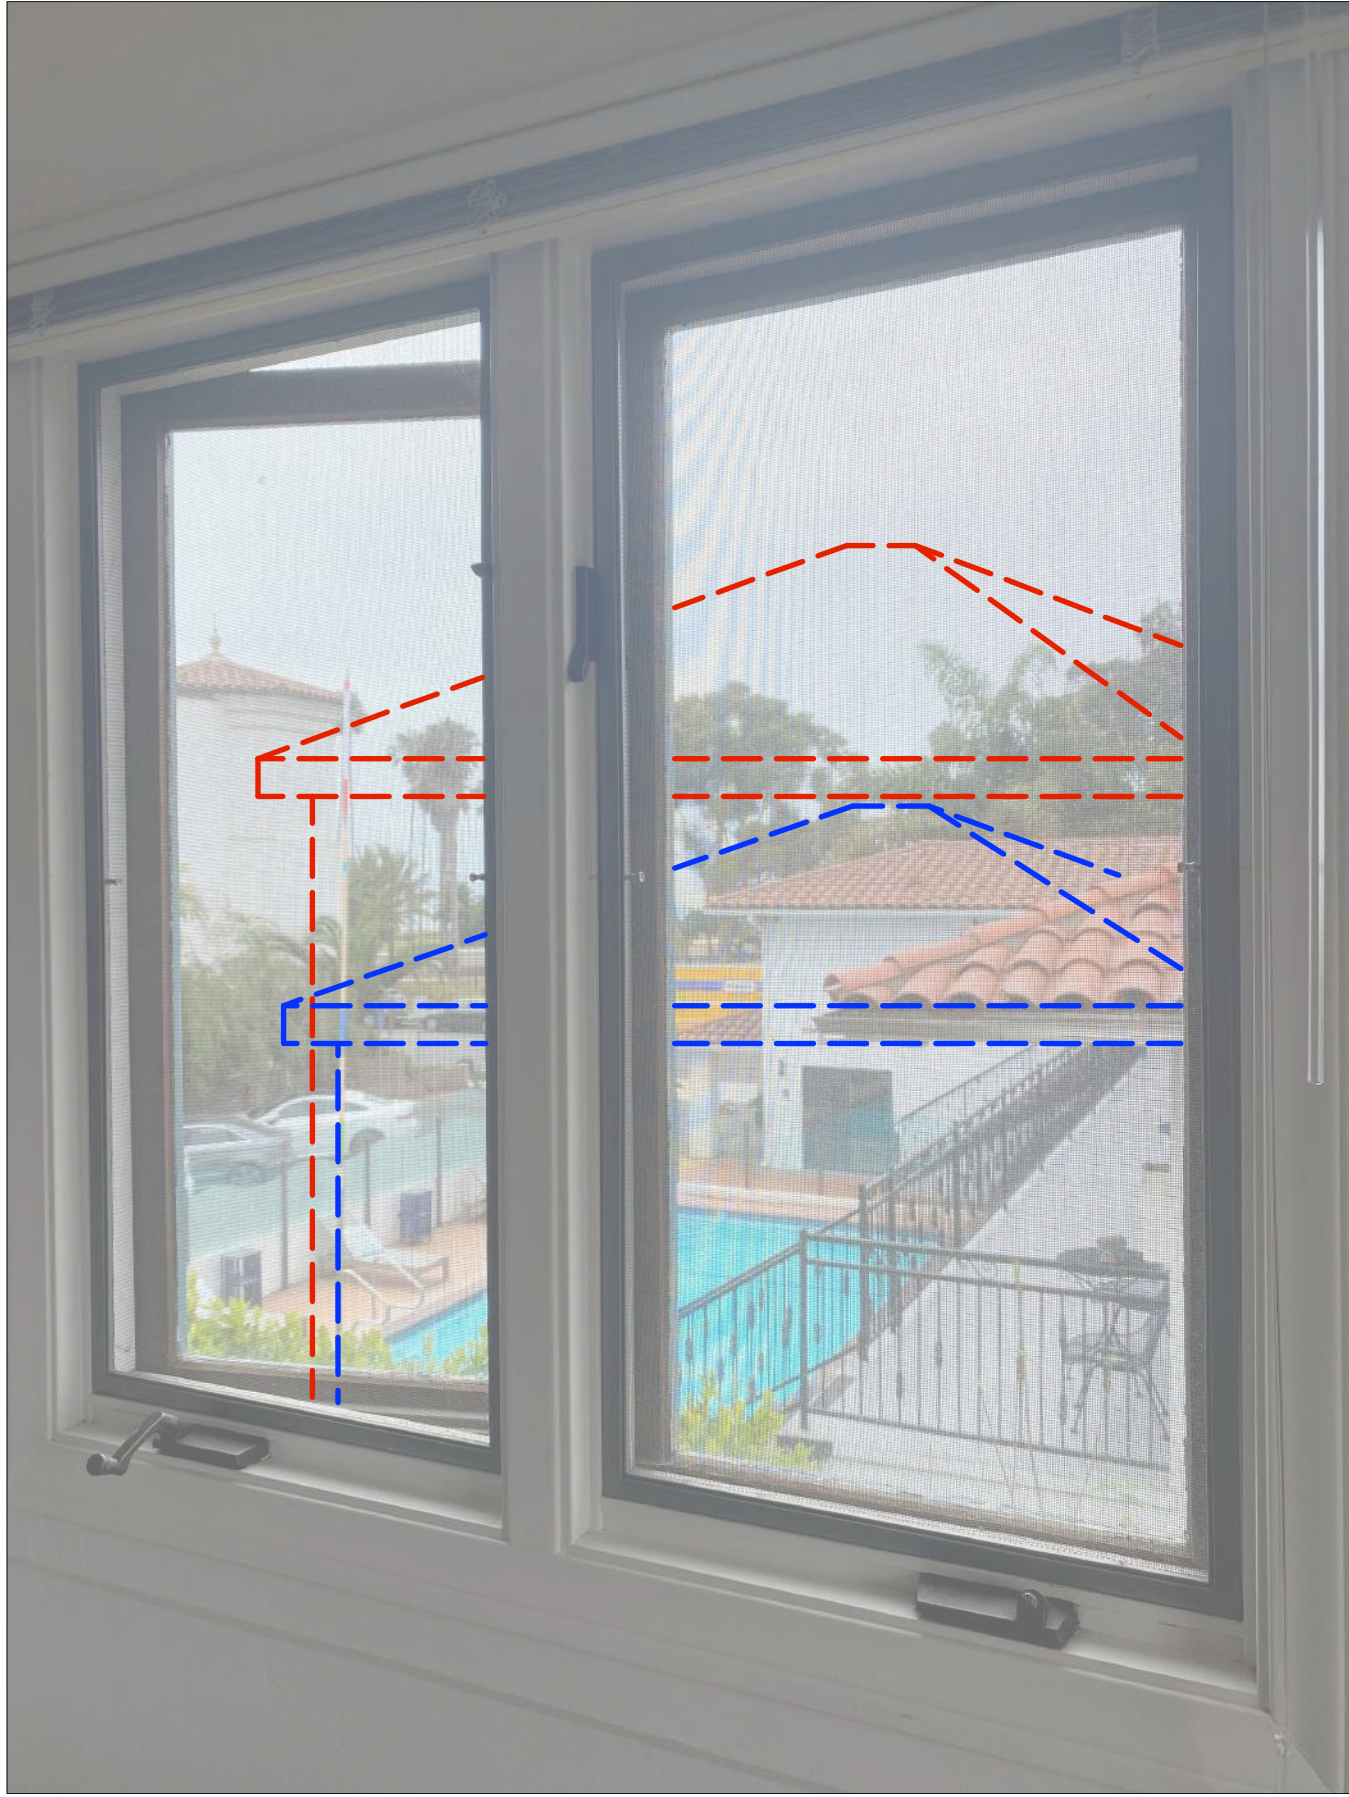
PHOTO VIEW STUDY FROM THE BEDROOM OF THE ADJACENT STRUCTURE.
